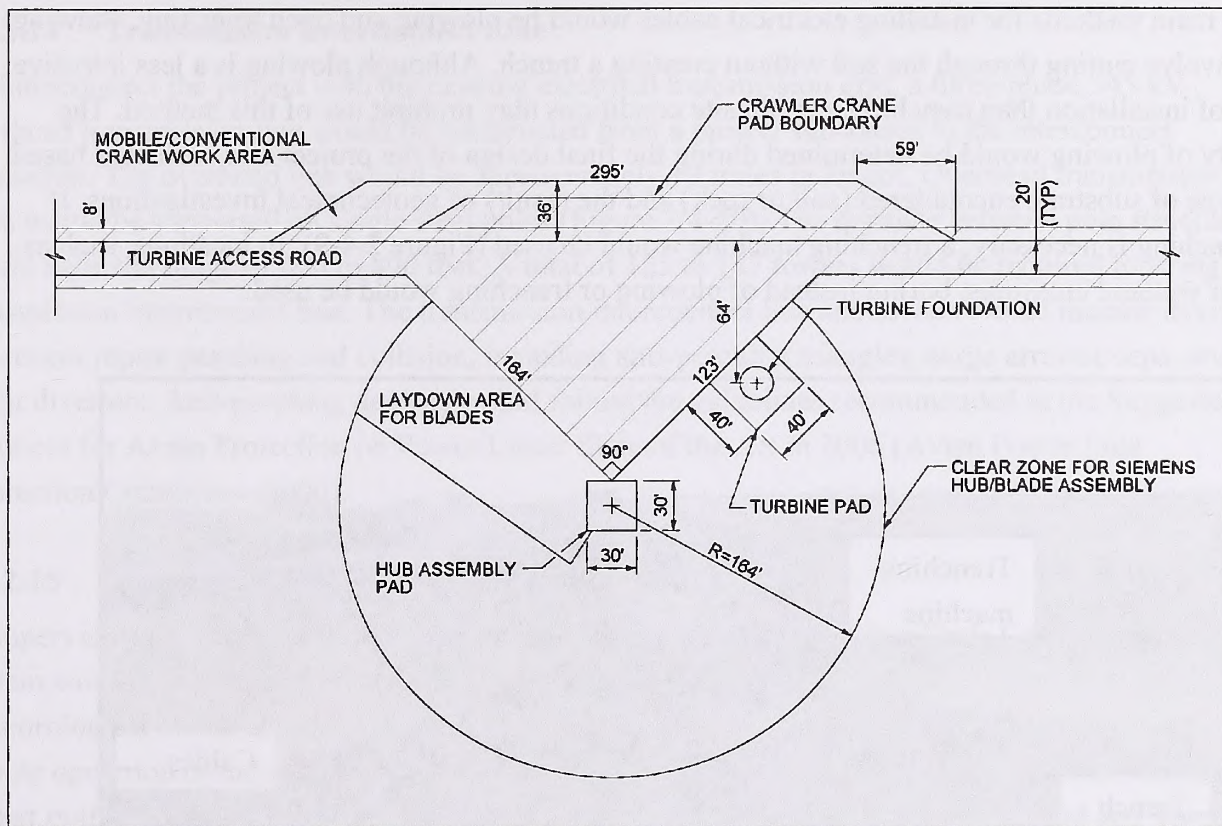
Detail of Typical Construction Area for Turbines.
